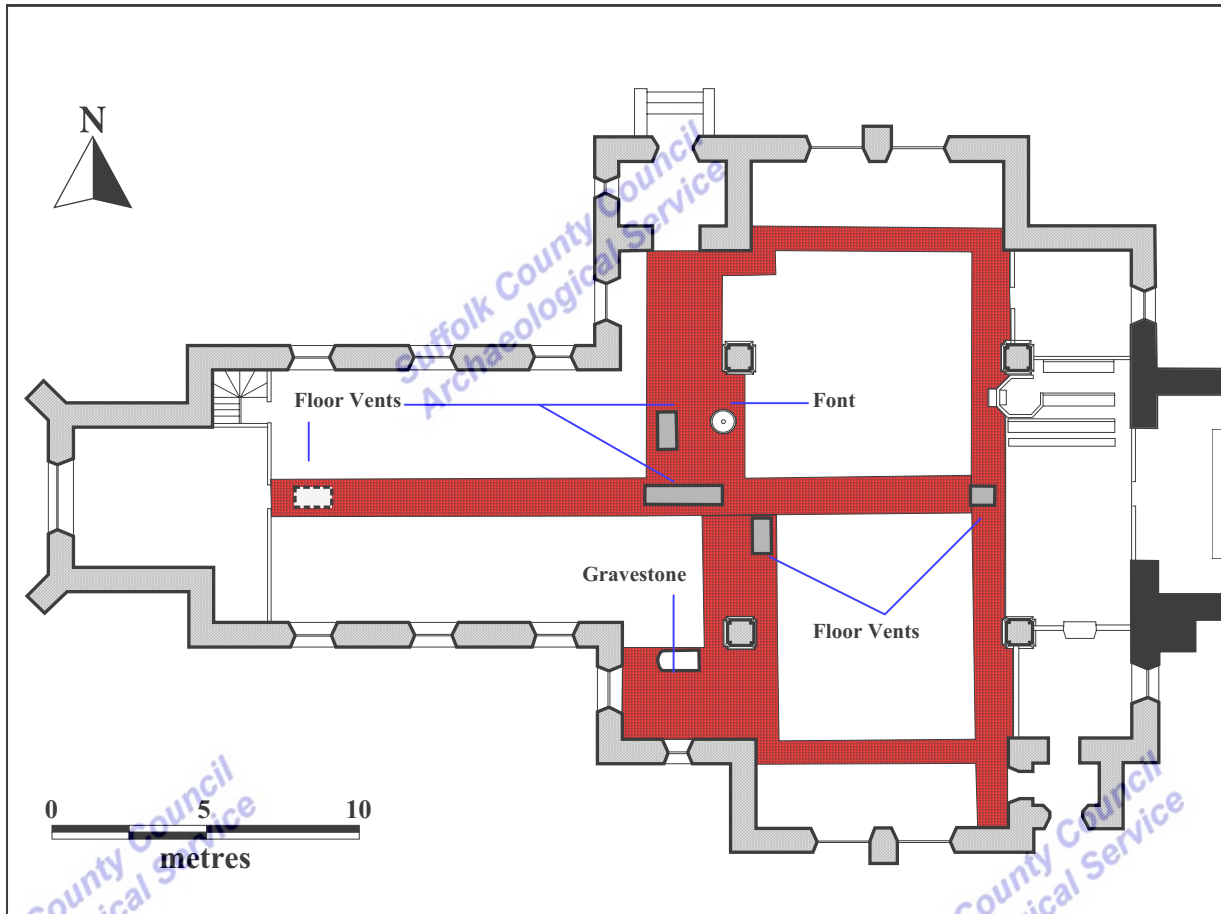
1:250 Scale Plan Showing Tiled Floors
